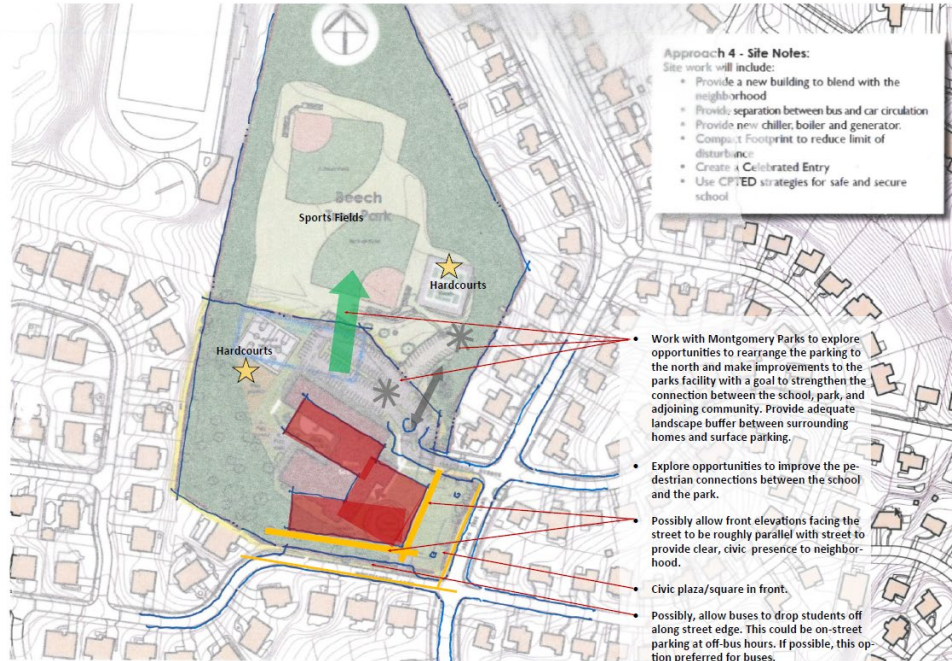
MCPS Site Plan Approach 4C (B) – Open Court Scheme
